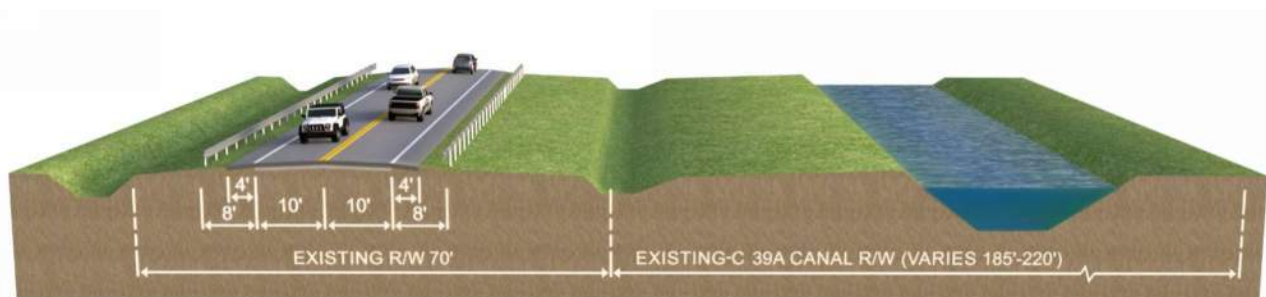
SR 70 – Existing Roadway Typical Section Two
